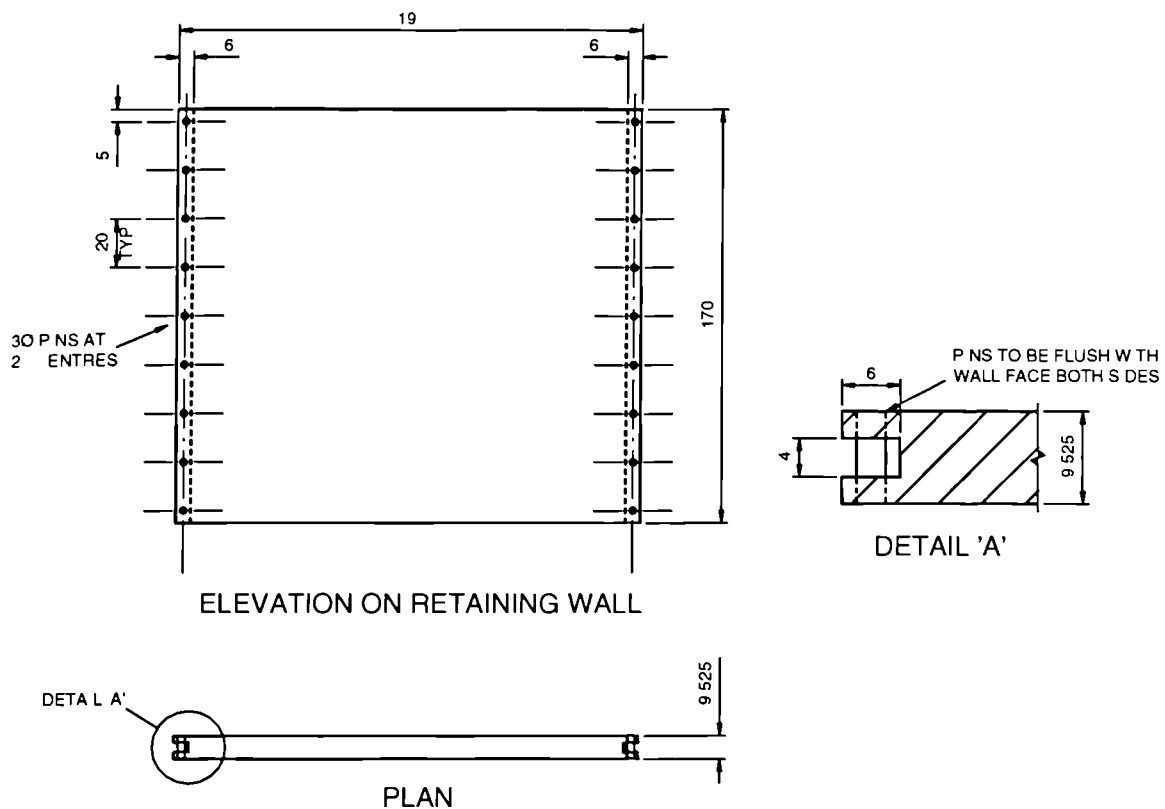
Details of model retaining wall and method of securing cast silicone rubber seals into rebates
